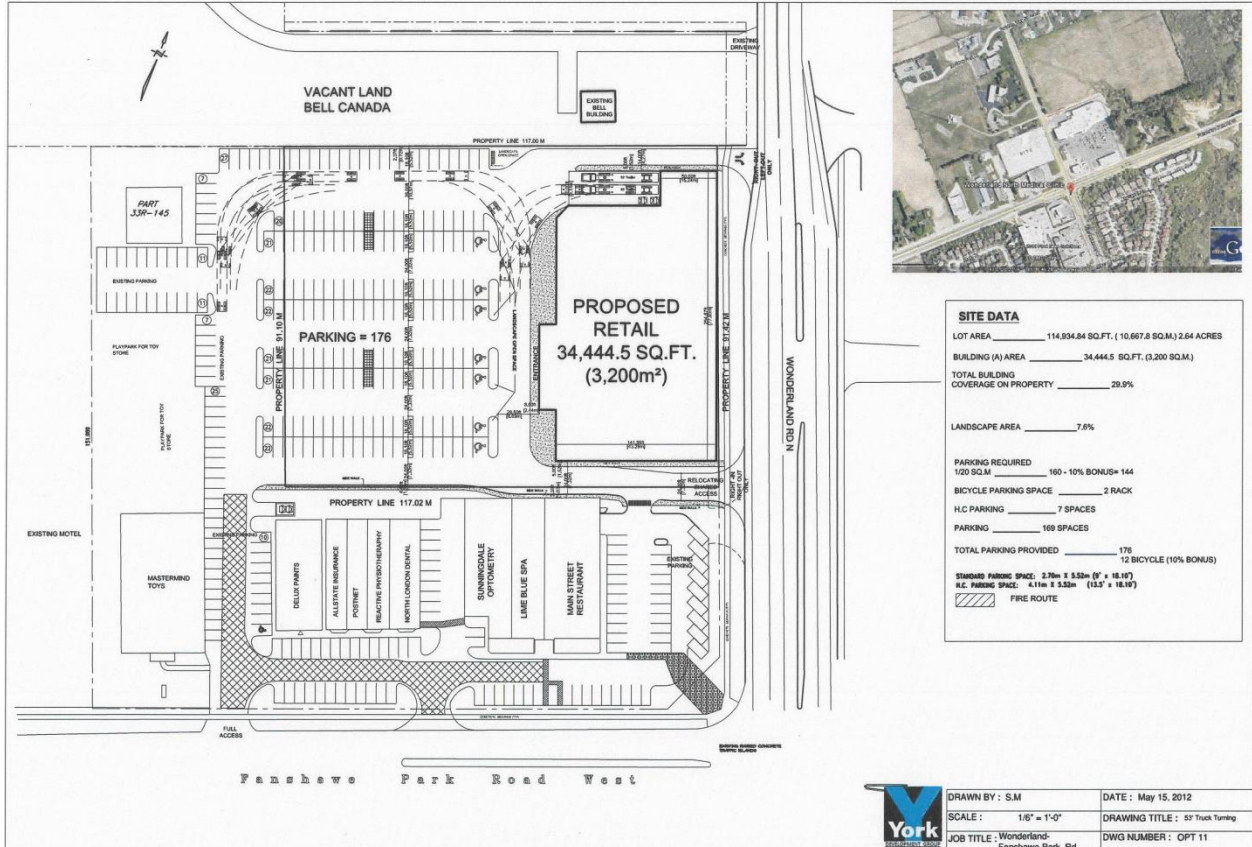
Revised conceptual site plan submitted by the applicant in 2012 illustrating restricted access to the site at the northern driveway, the extension of the centre median to prohibit left-out movement, and a new internal access from the west.
